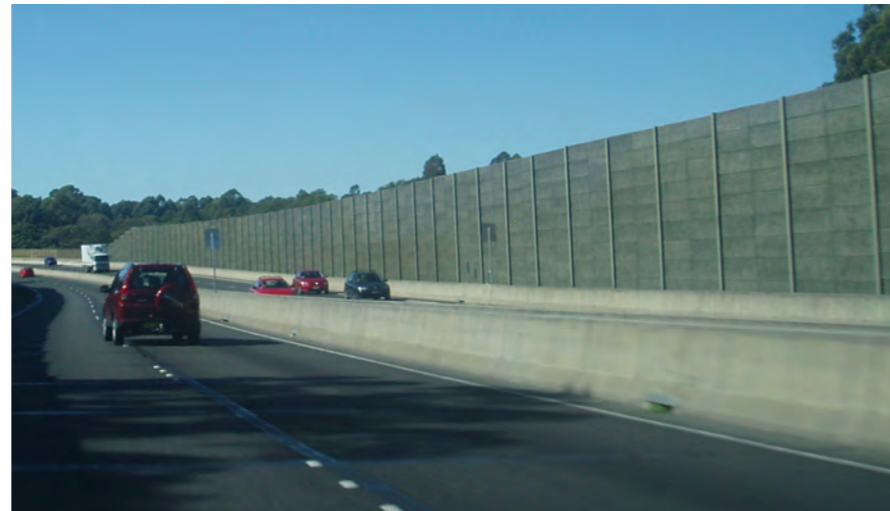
Noise wall directly adjacent to concrete traffic barrier.
